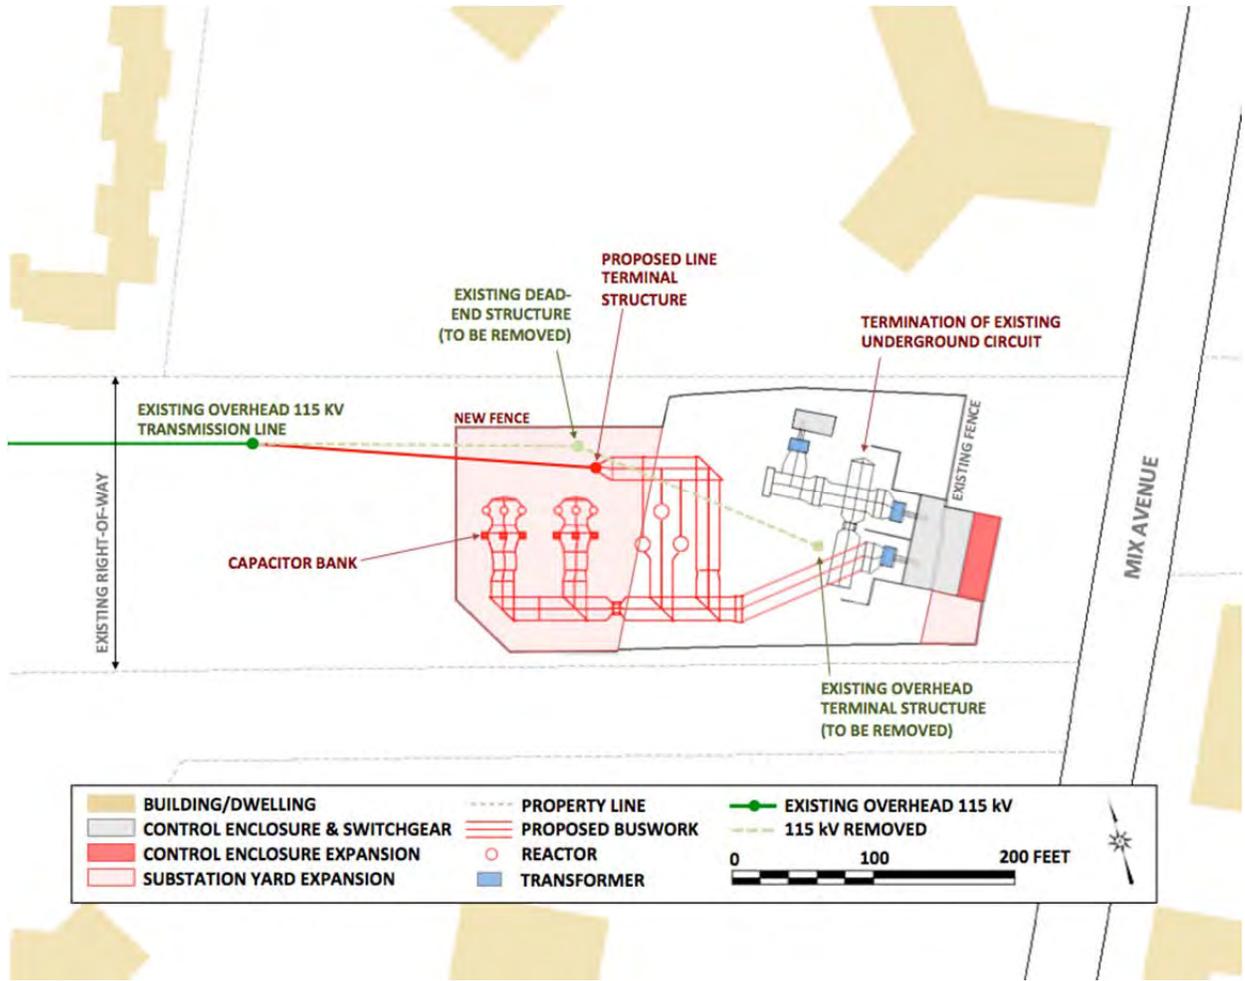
Plan view of the proposed expansion of the Mix Avenue Substation.
